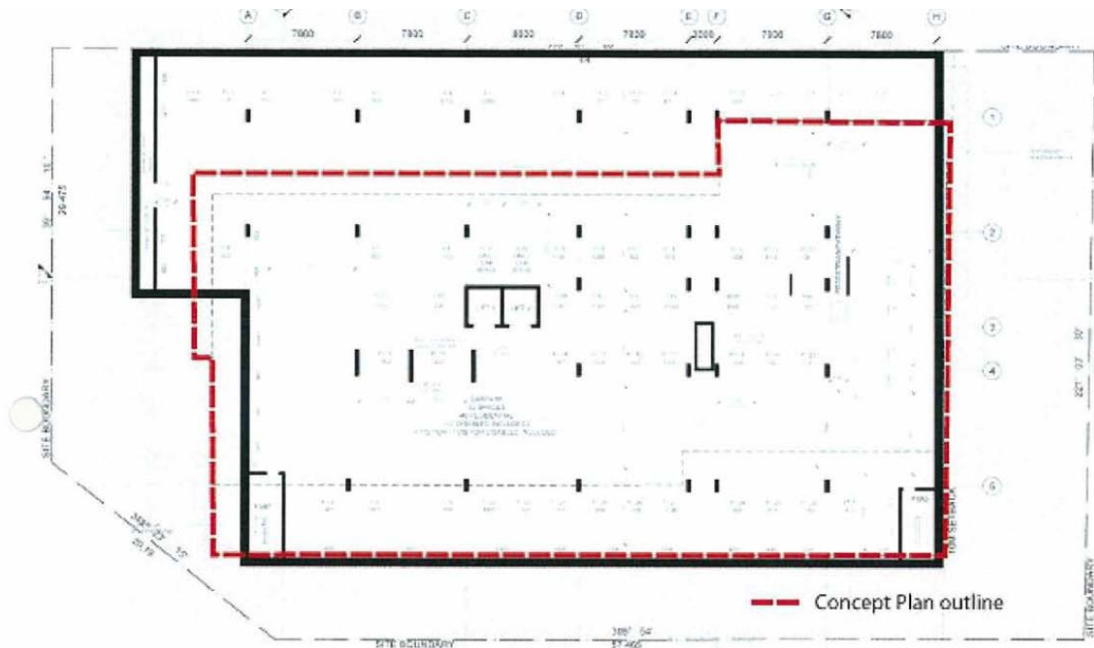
Basement floor plan showing the approved concept plan outlined in red.
